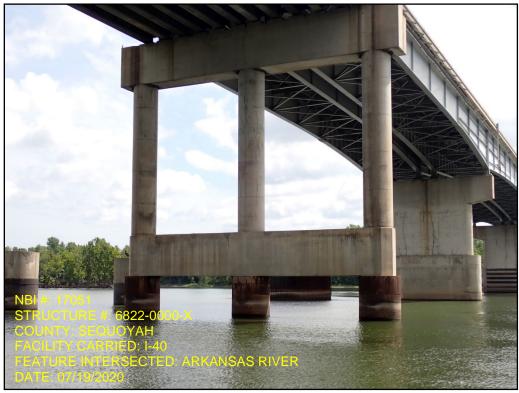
Pier 3, typical configuration for Piers 2 and 3
